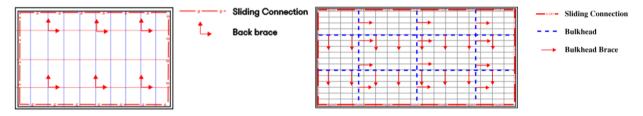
Plan view of back braced suspended ceiling with perimeter floating/sliding connection
